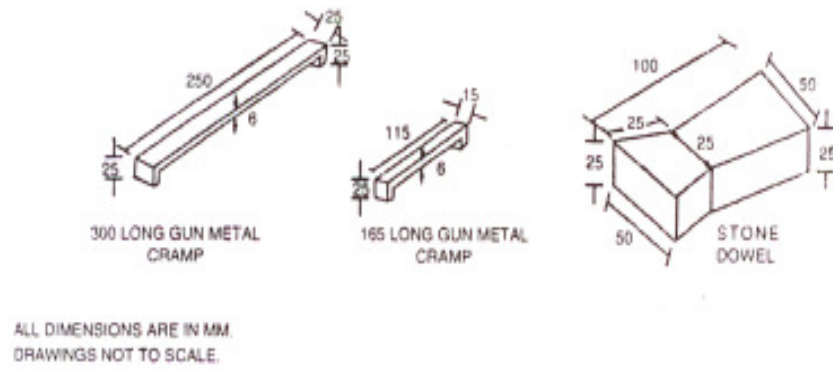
Detail of Gun Metal Cramps and stone Dowel
